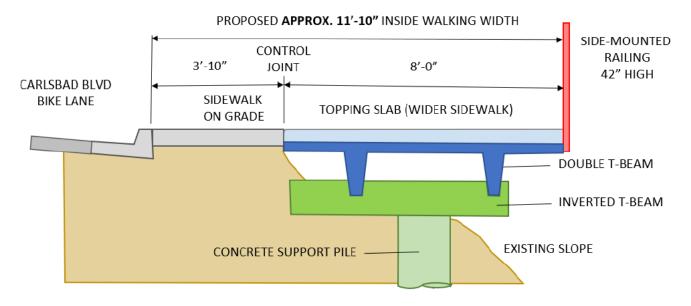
Proposed Upper Sidewalk - Pine Avenue to Maple Avenue
